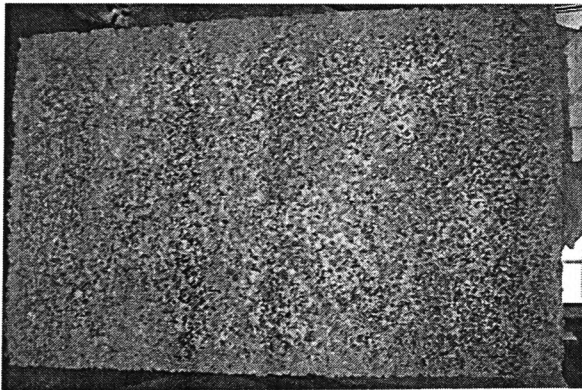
Concrete slab impregnated with 10 mm angular stones
